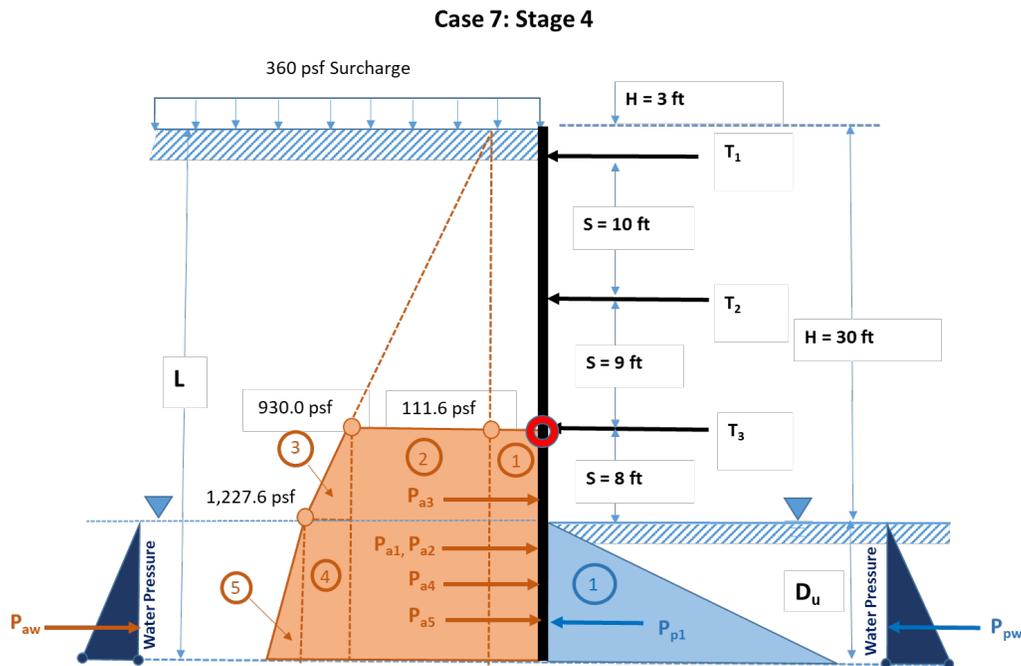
Case 7 Stage 4 analysis of anchor-cantilever wall section below Strut 3.
